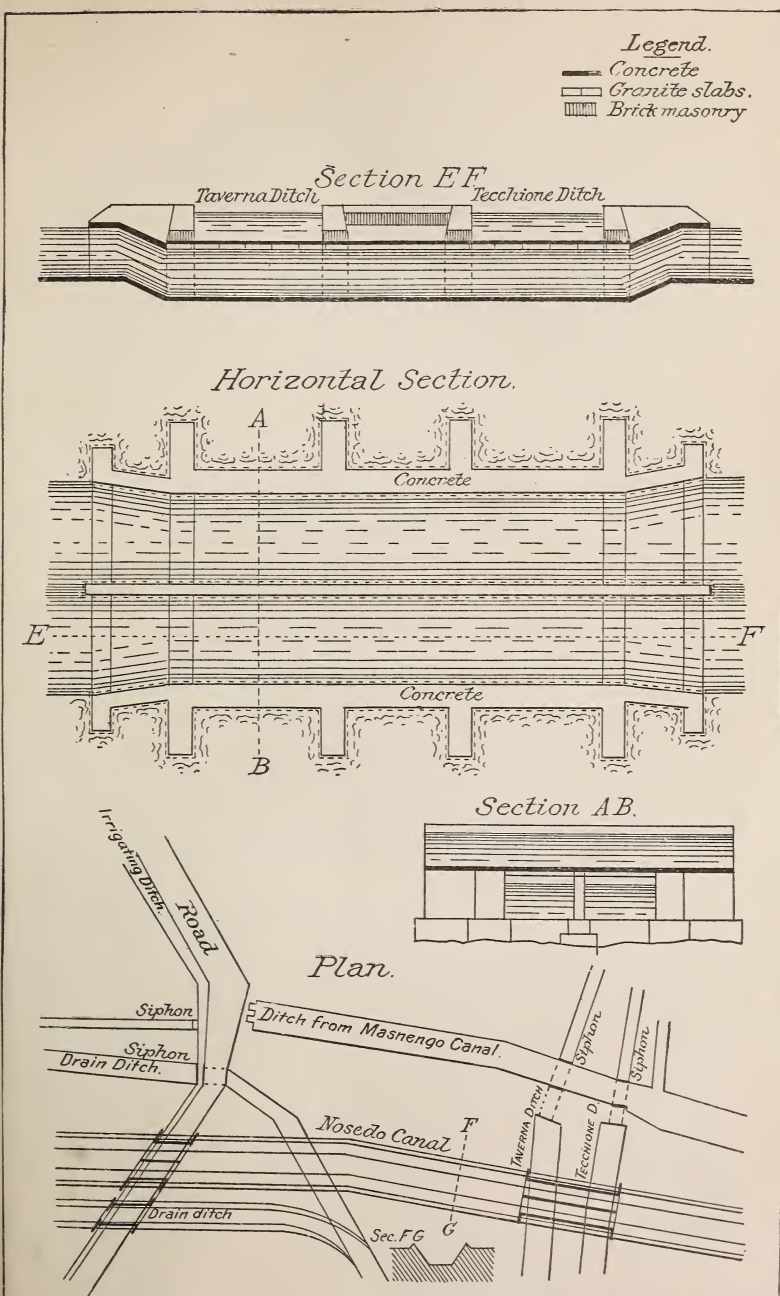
Vertical and horizontal sections and plan showing siphon for passage of the Nosedo Canal under the Taverno and Tecchione ditches.
